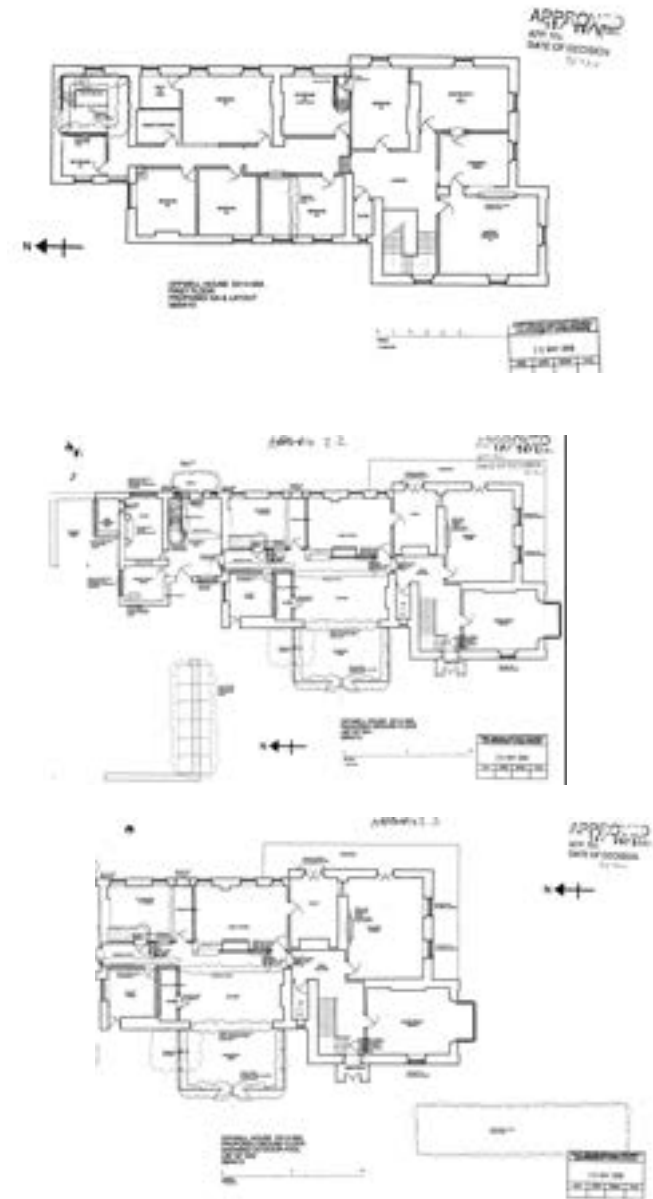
Original plans from 2010 LBC Application Ref: 10/0975/LBC
